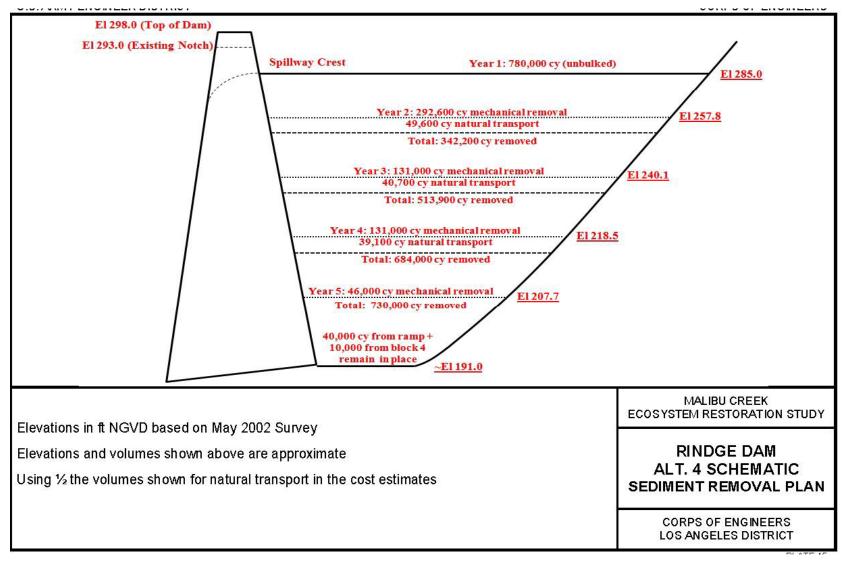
Rindge Dam, Alt. 4 Schematic Sediment Removal Plan
